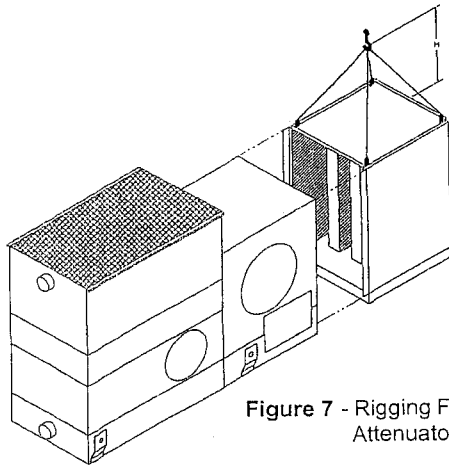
Rigging Fan-End Sound Attenuator Assembly
